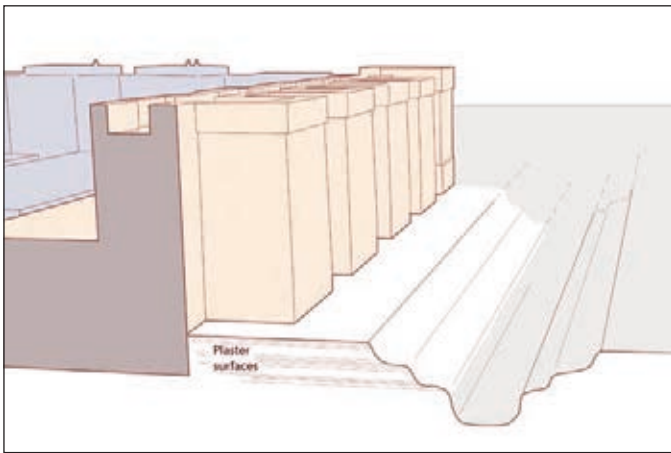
Cut-away view of the plaster surfaces against the southeastern wall of the building. The ditch profile shown in white is based on the excavated section, while the grey-shaded area is a hypothetical reconstruction assuming a symmetrical cut. The walls are reconstructed to a height of 8 m (excluding the parapet). View is facing roughly north.
